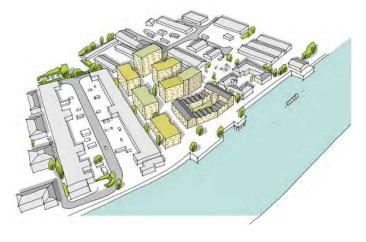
ILLUSTRATIVE MASTERPLAN OF SITE 1
